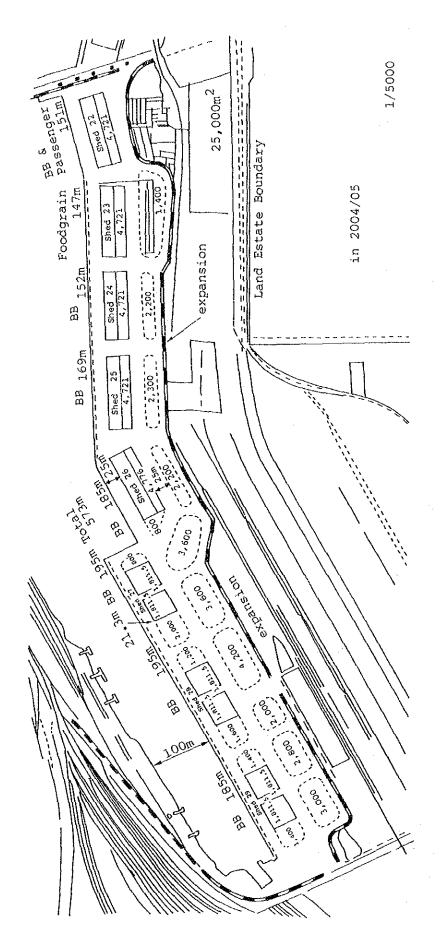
Improvement Plan of East Side of KPD2 in 2004/05
